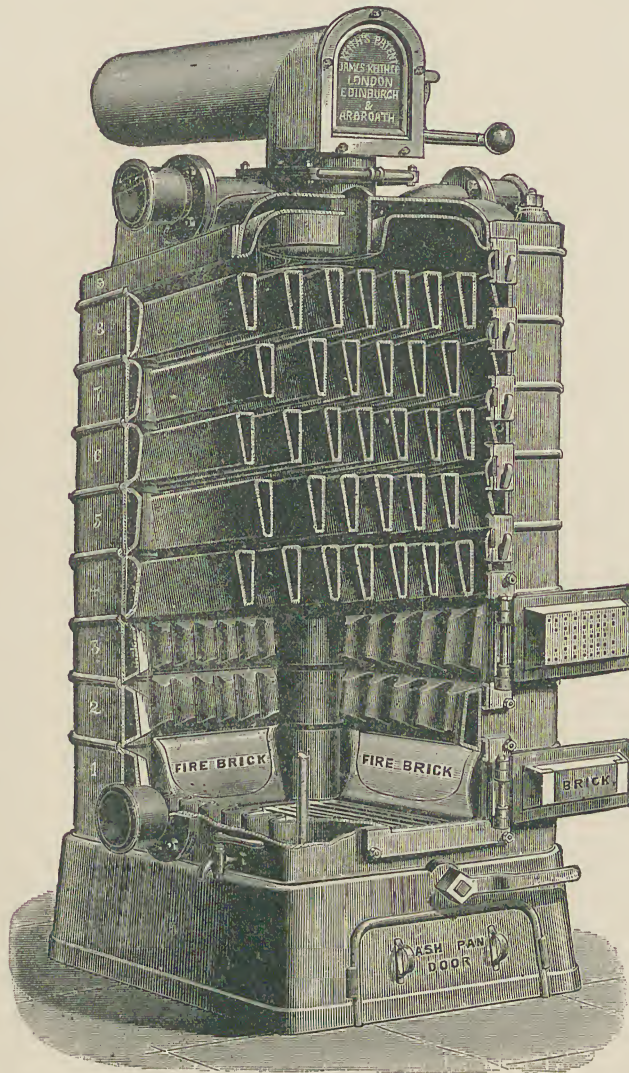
Sectional View of the “Challenge” Cast-iron Boiler.
